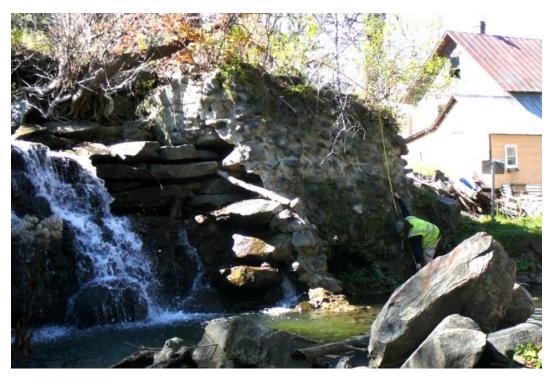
View of the turbine pit structure associated with the mill building, showing the rough stone and concrete 'shell' around and above the older structure, looking northwest.
